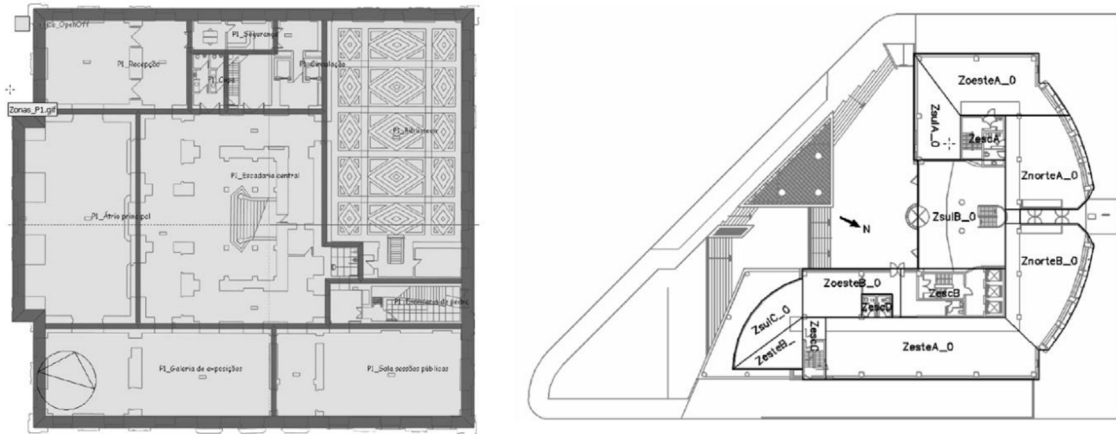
Example of model thermal zoning. Left, historical building (1st floor); right, contemporary building (entrance floor).
